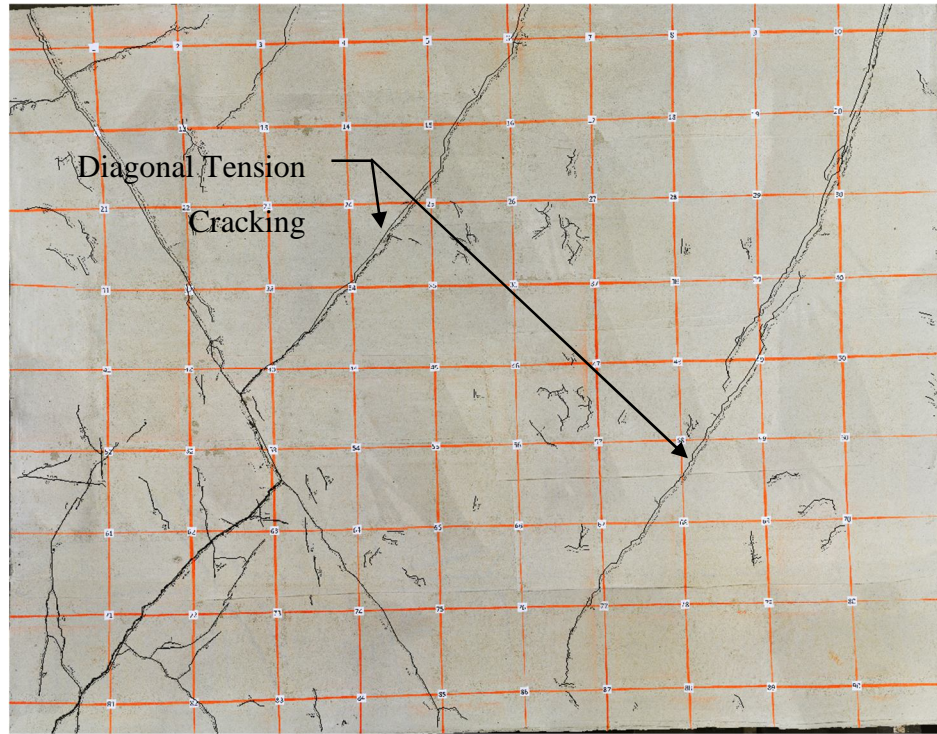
Crack Distribution of Specimen 3/7.5-4-N-NF-DT Diagonal Tension Cracking (Point C in Figure 3-13)
